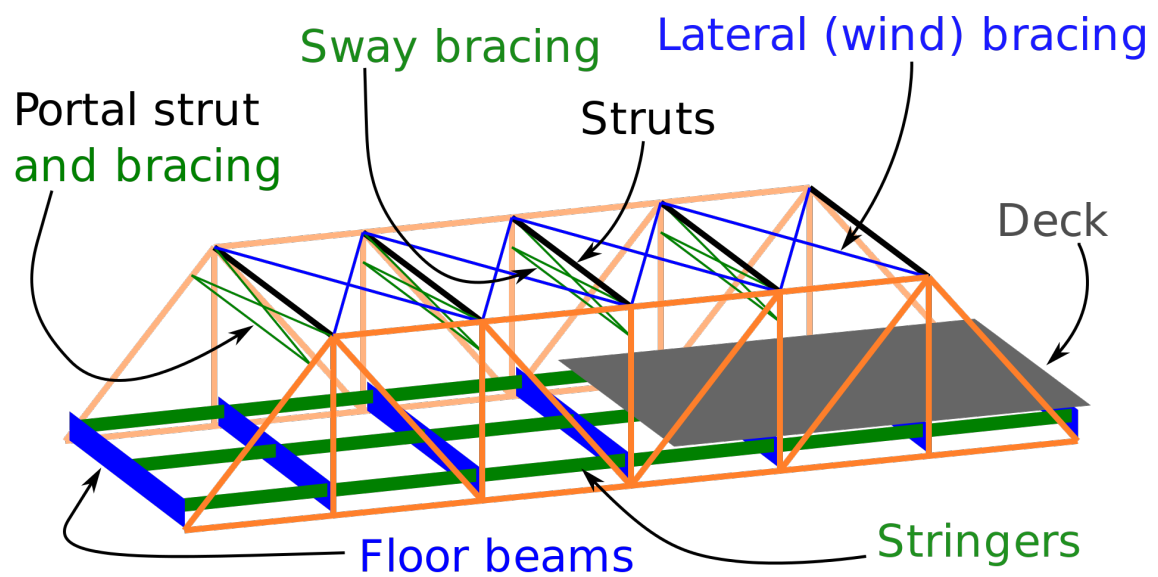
Schematic example of a truss bridge with denoted structural elements. Adapted from Wikimedia
